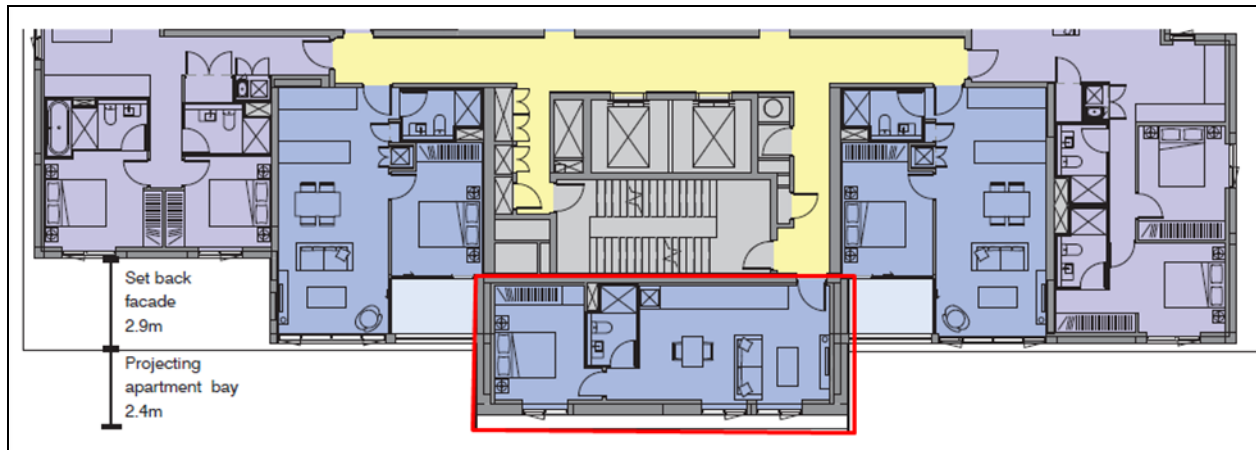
One bedroom apartment (highlighted in red) within the projecting bay on the western elevation of building SW1 (Source: applicant's RtS)
